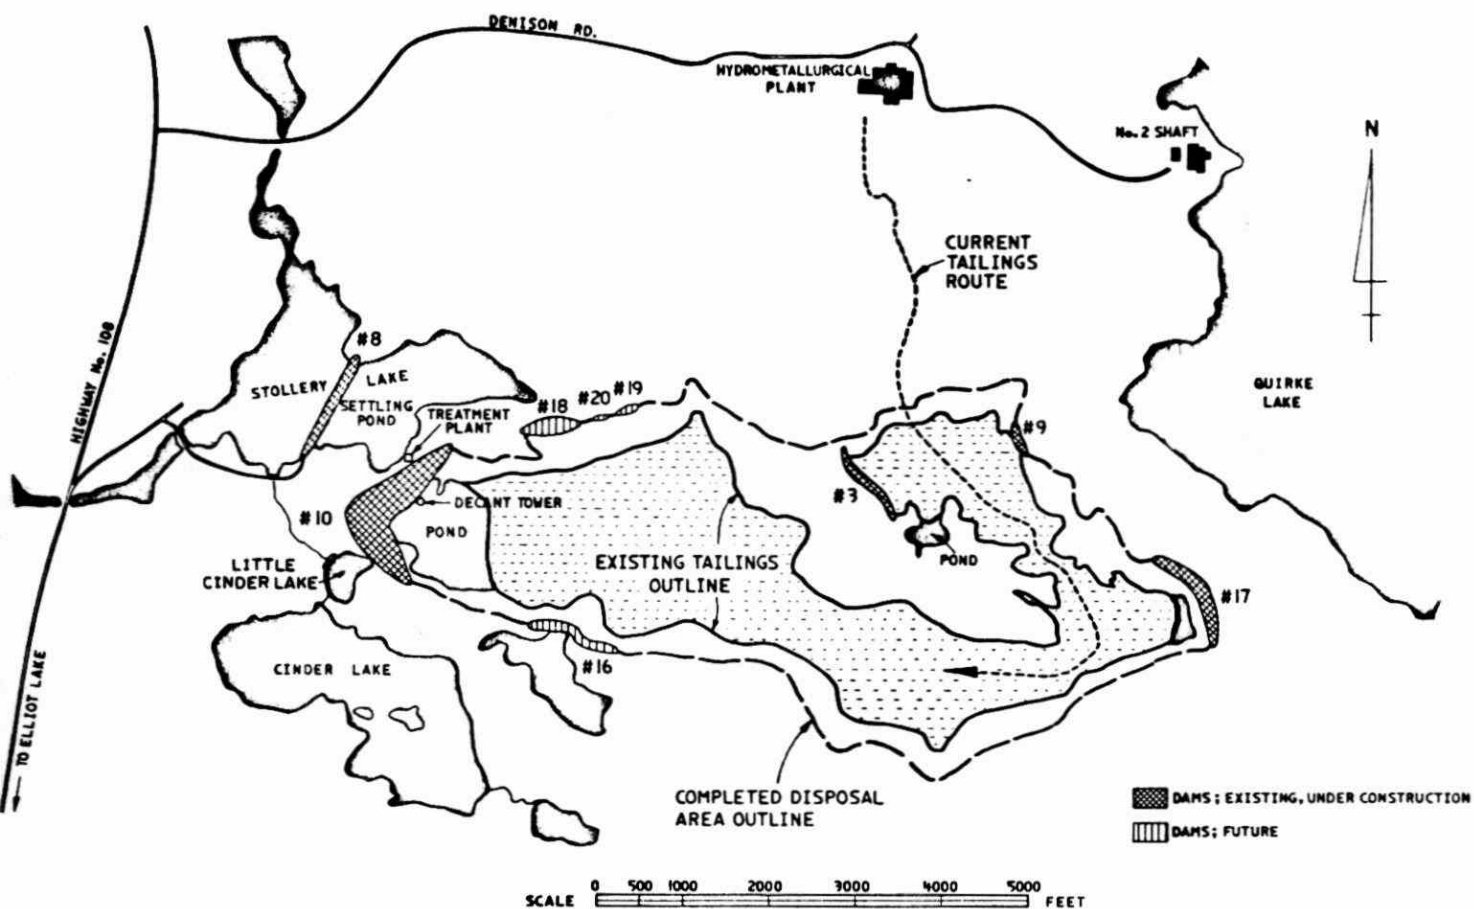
KEY PLAN - DENISON DISPOSAL AREA
